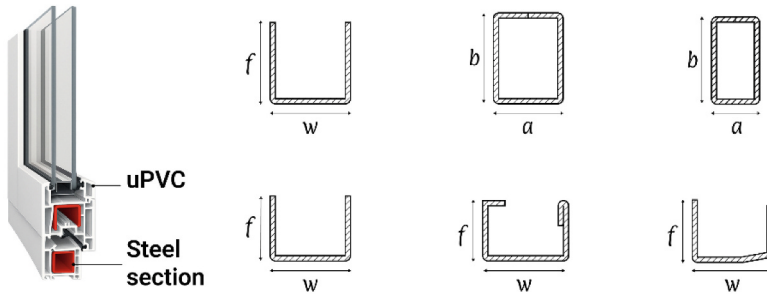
CFS in window design: left – cross-section of a typical window frame with inserted elements (red); right – schematic geometry with dimensions w and f – width and flange height; a and b – RHS width and height. Original drawing prepared by the authors.
